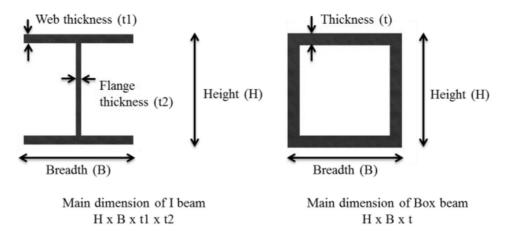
Cross section area shape and main dimension of I-beam and Box beam.
